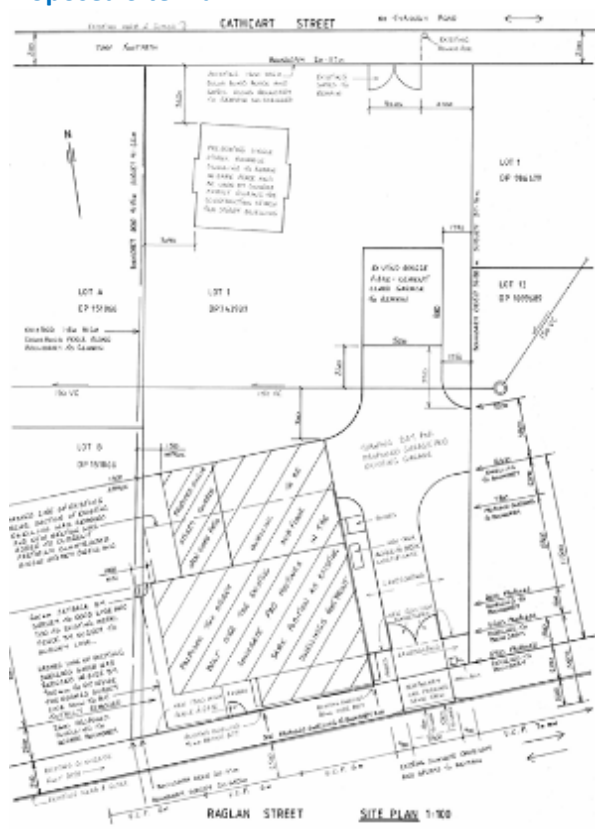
Proposed Site Plan (Source: Raymond Terrace Planning Services)
